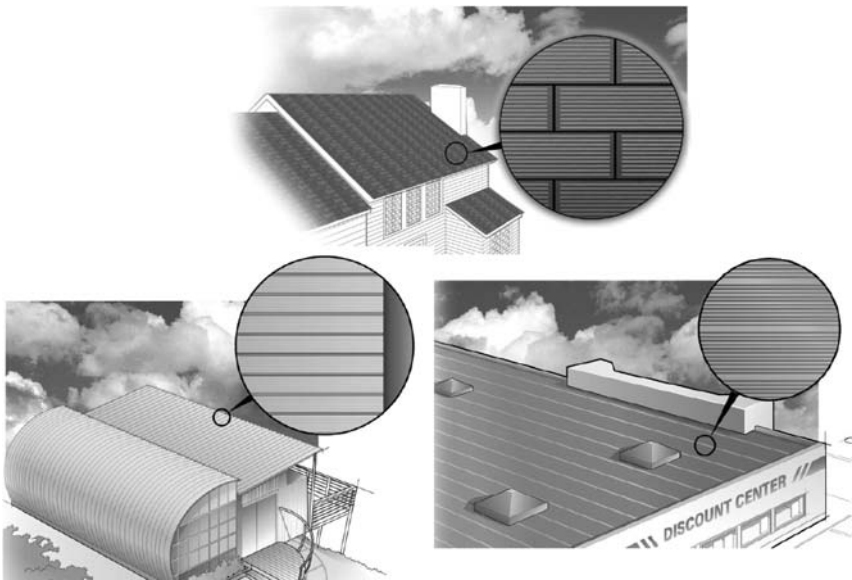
New flexible solar modules are integrated, rather than installed, into existing or new buildings (adapted from Konarka).
